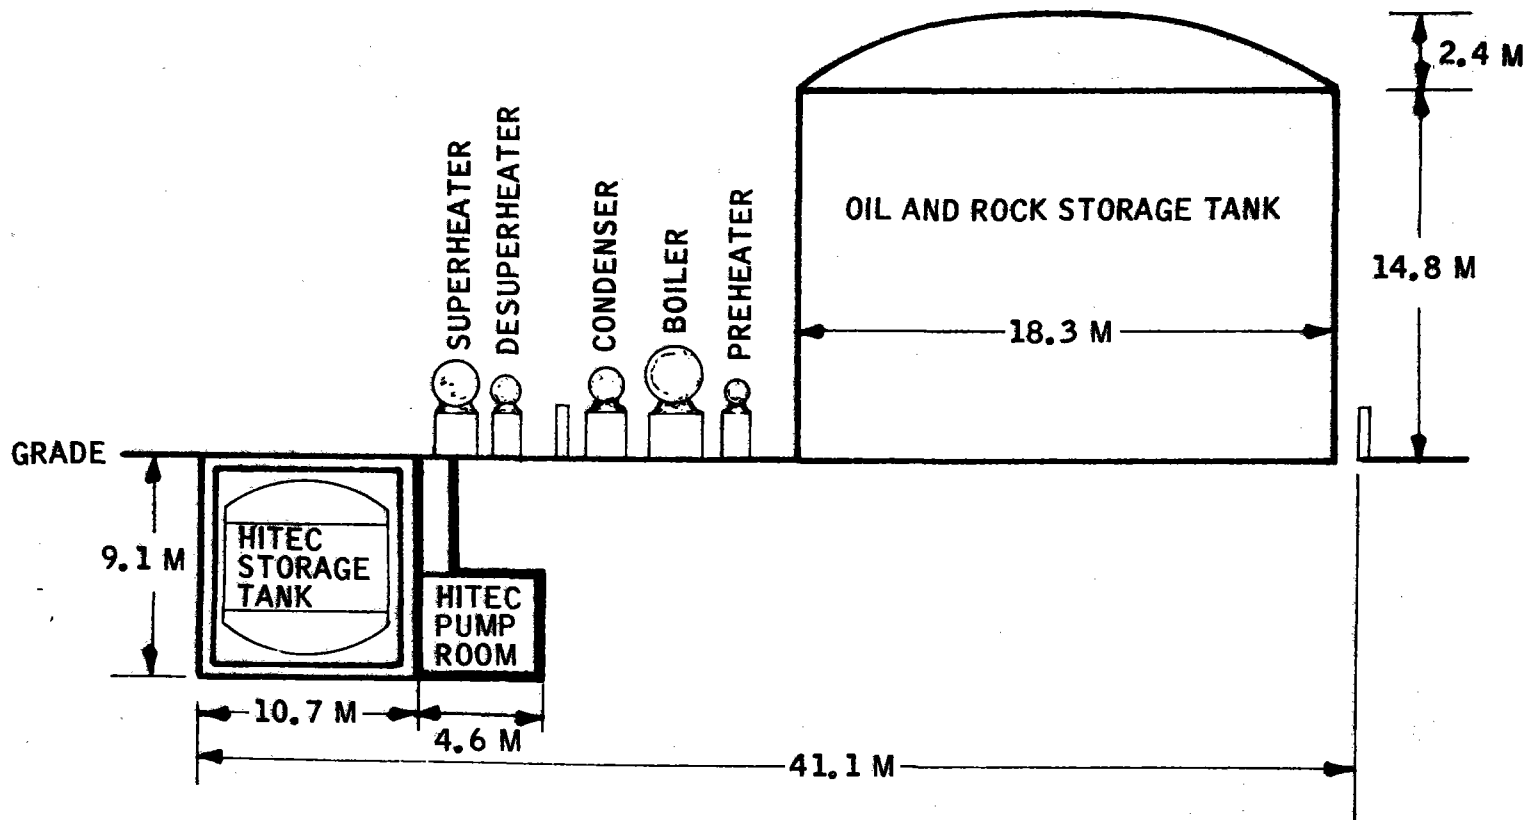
Pilot Plant Storage Subsystem Arrangement
